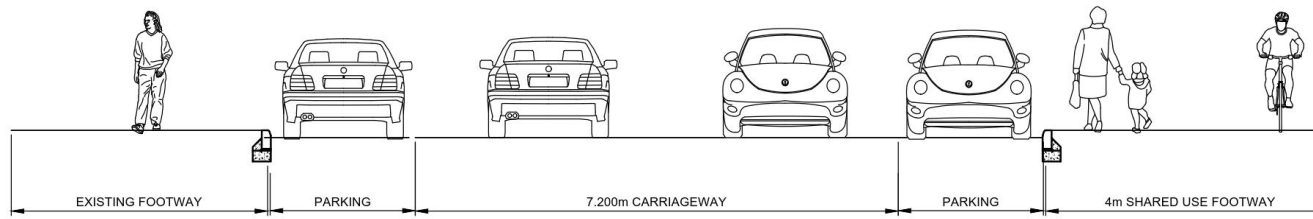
Cross Section Route 6 – Newcraighall Drive to Fort Kinnaird
